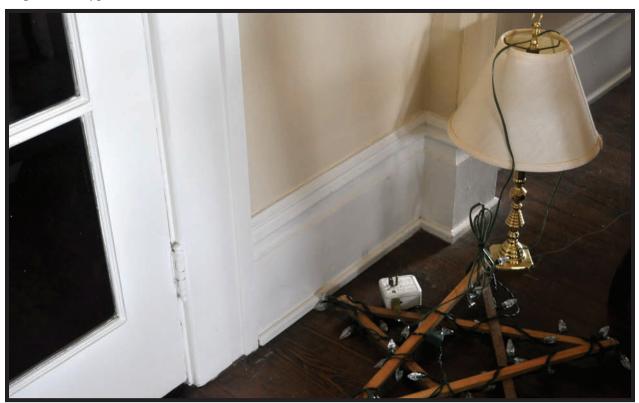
French Doors to Stair Hall and Dining Room Showing Typical Surround
